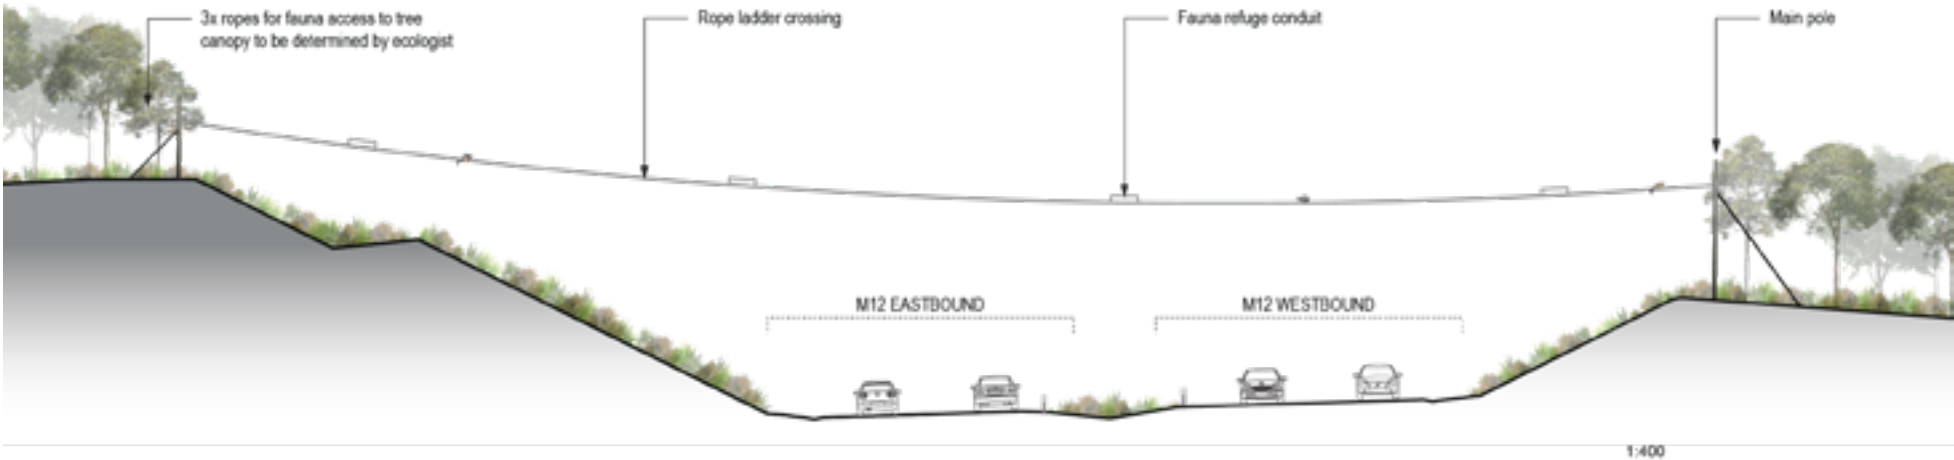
Section - Fauna crossing at Western Sydney Parklands
